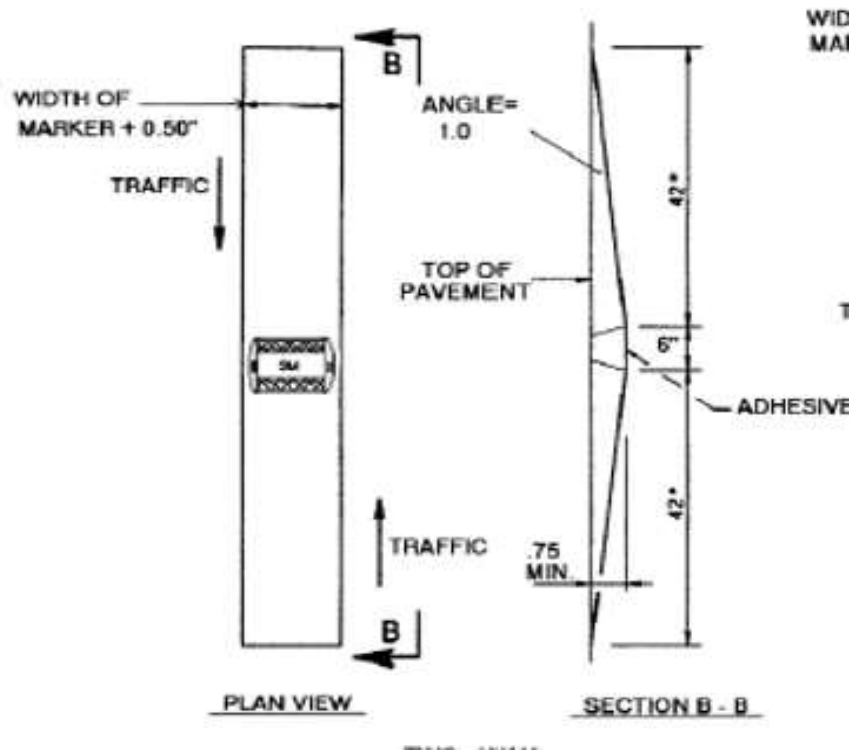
Section View Showing Slot Dimensions and Marker Position in Slot
